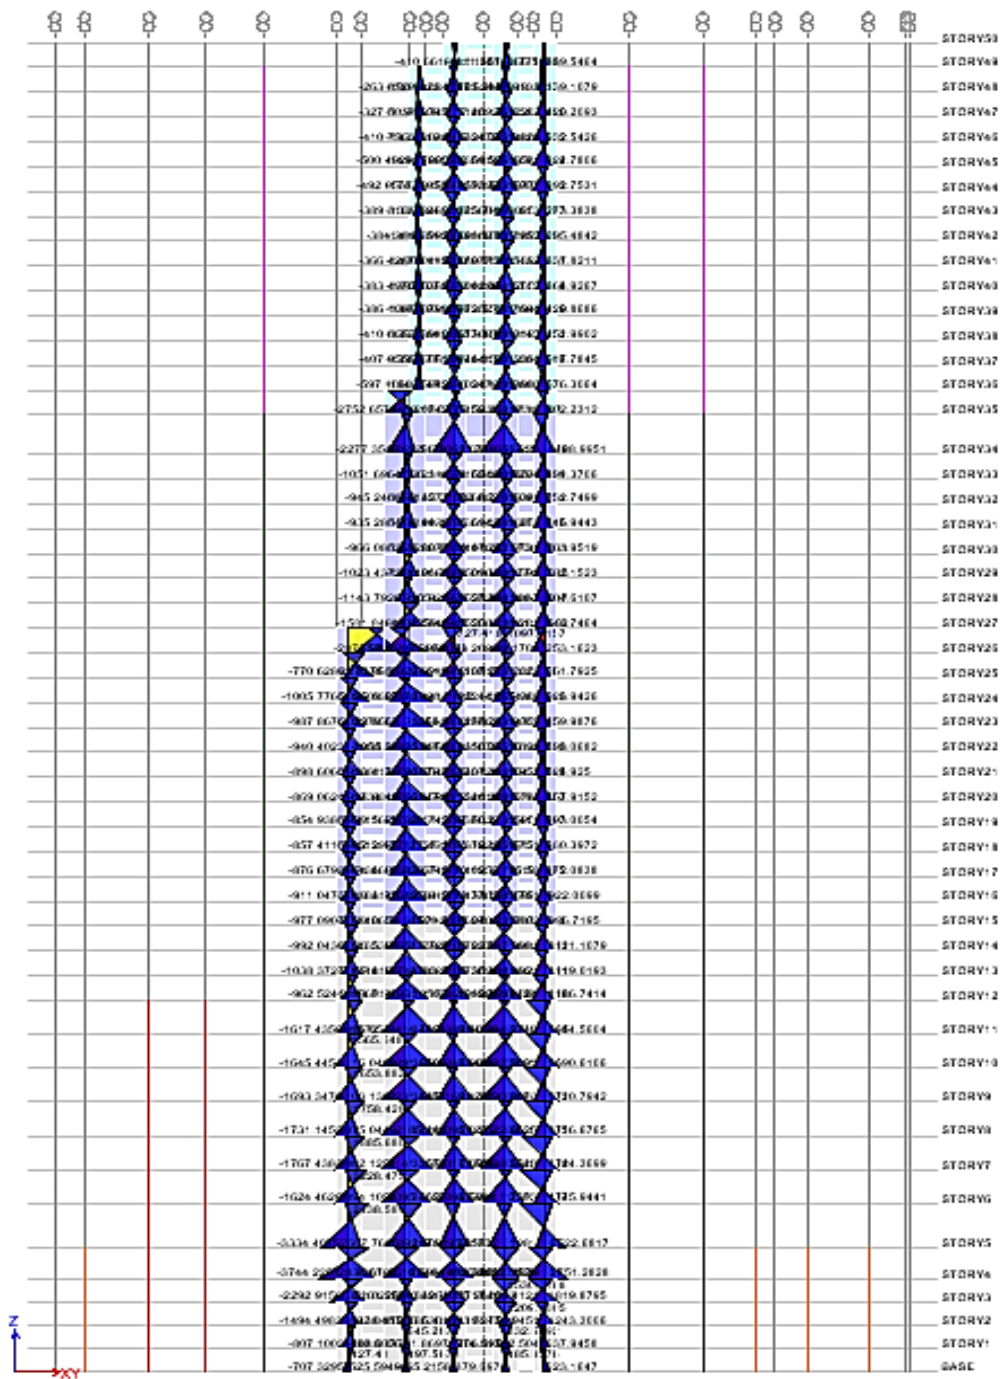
Coupled walls shear forces in seismic situation, elevation 7
